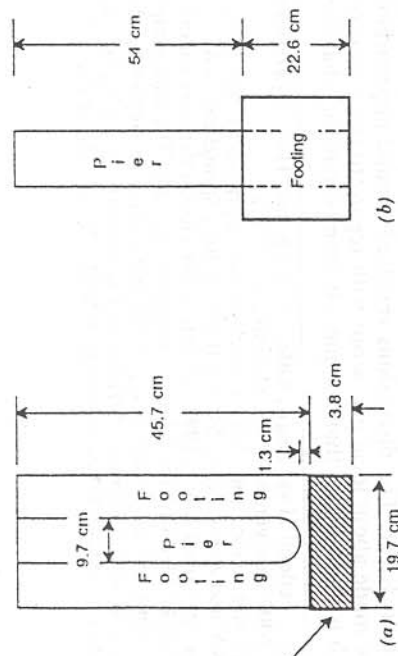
(a) Plan; and (b) Elevation View of 1:50 Scale Baldwin Bridge Pier Model
